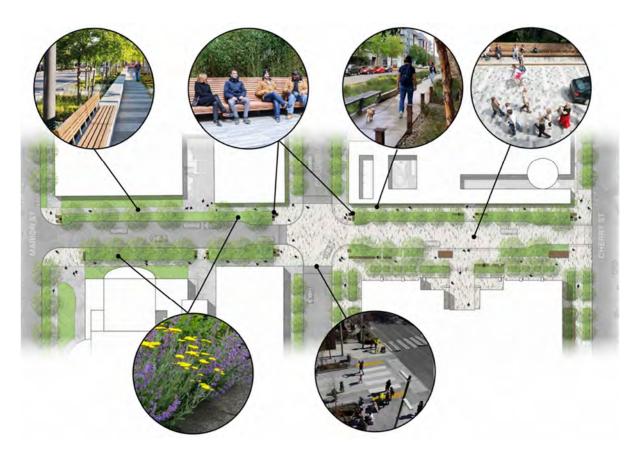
TERRY AVENUE STREET CONCEPT (FROM TERRY AVENUE VISION PLAN)
